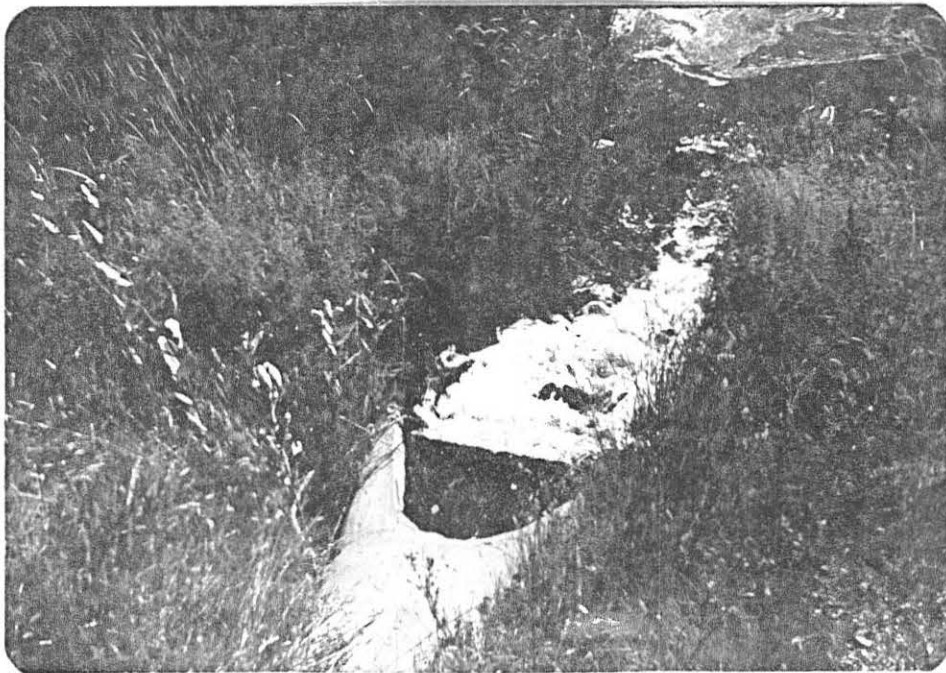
Lee, Stewart and Eskins inlet near the west end of the dam.
